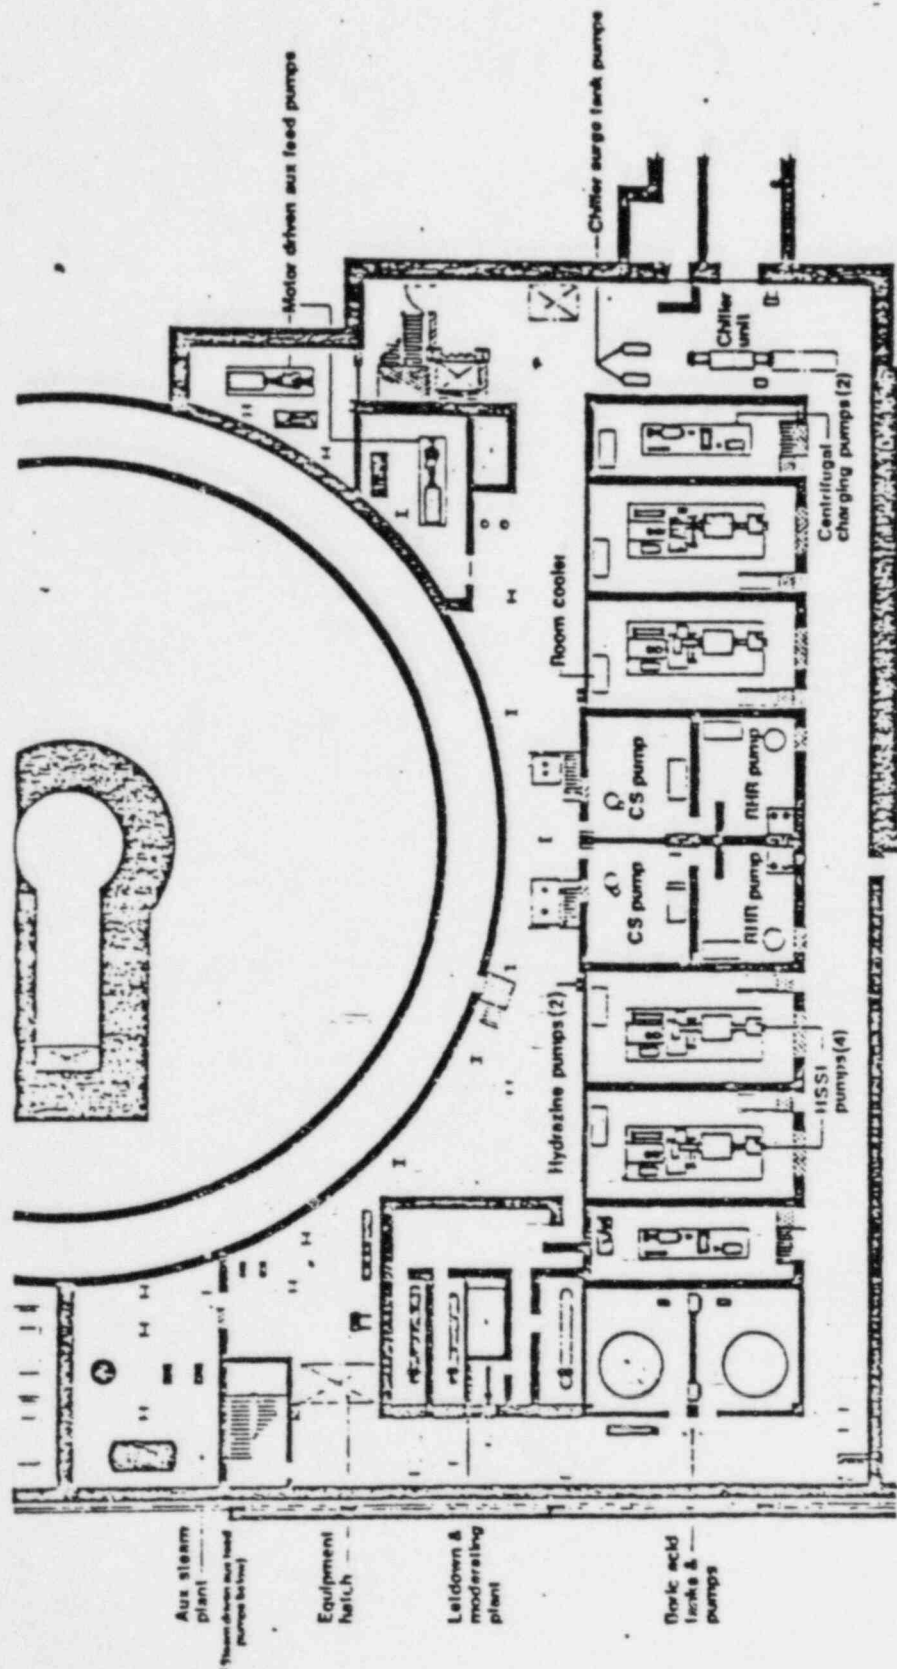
Sizewell B Power Station — auxiliary buildings plan at 1.375 m level
